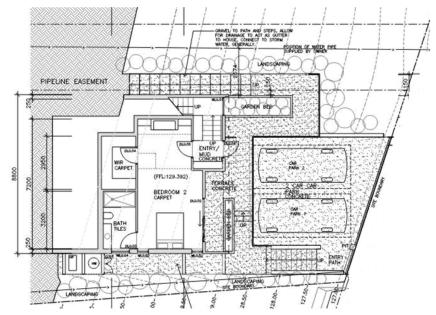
Lower floor for main dwelling (Steven Spizick Architect, 2021)
